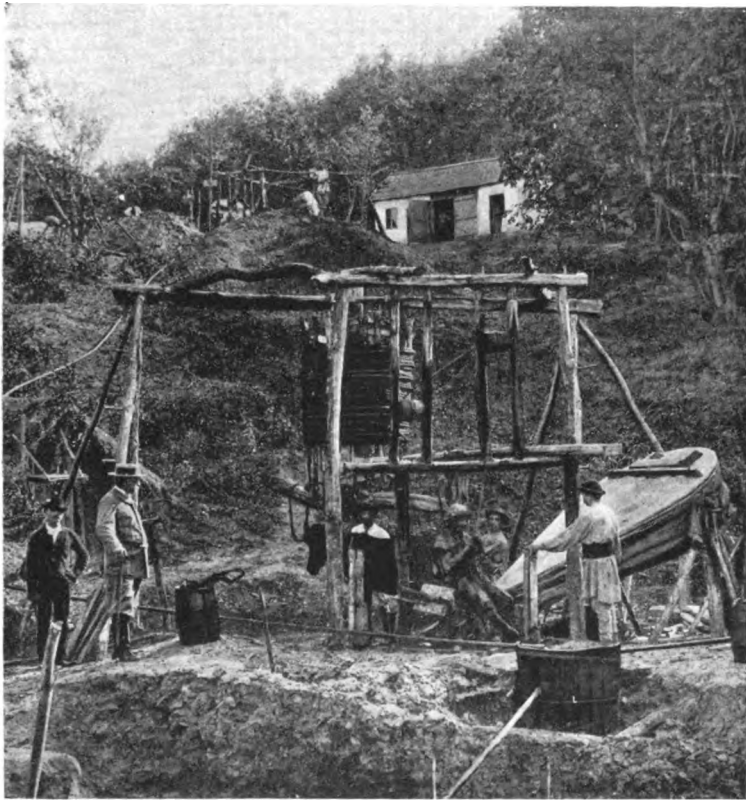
SINKING OIL SHAFTS BY HAND.
